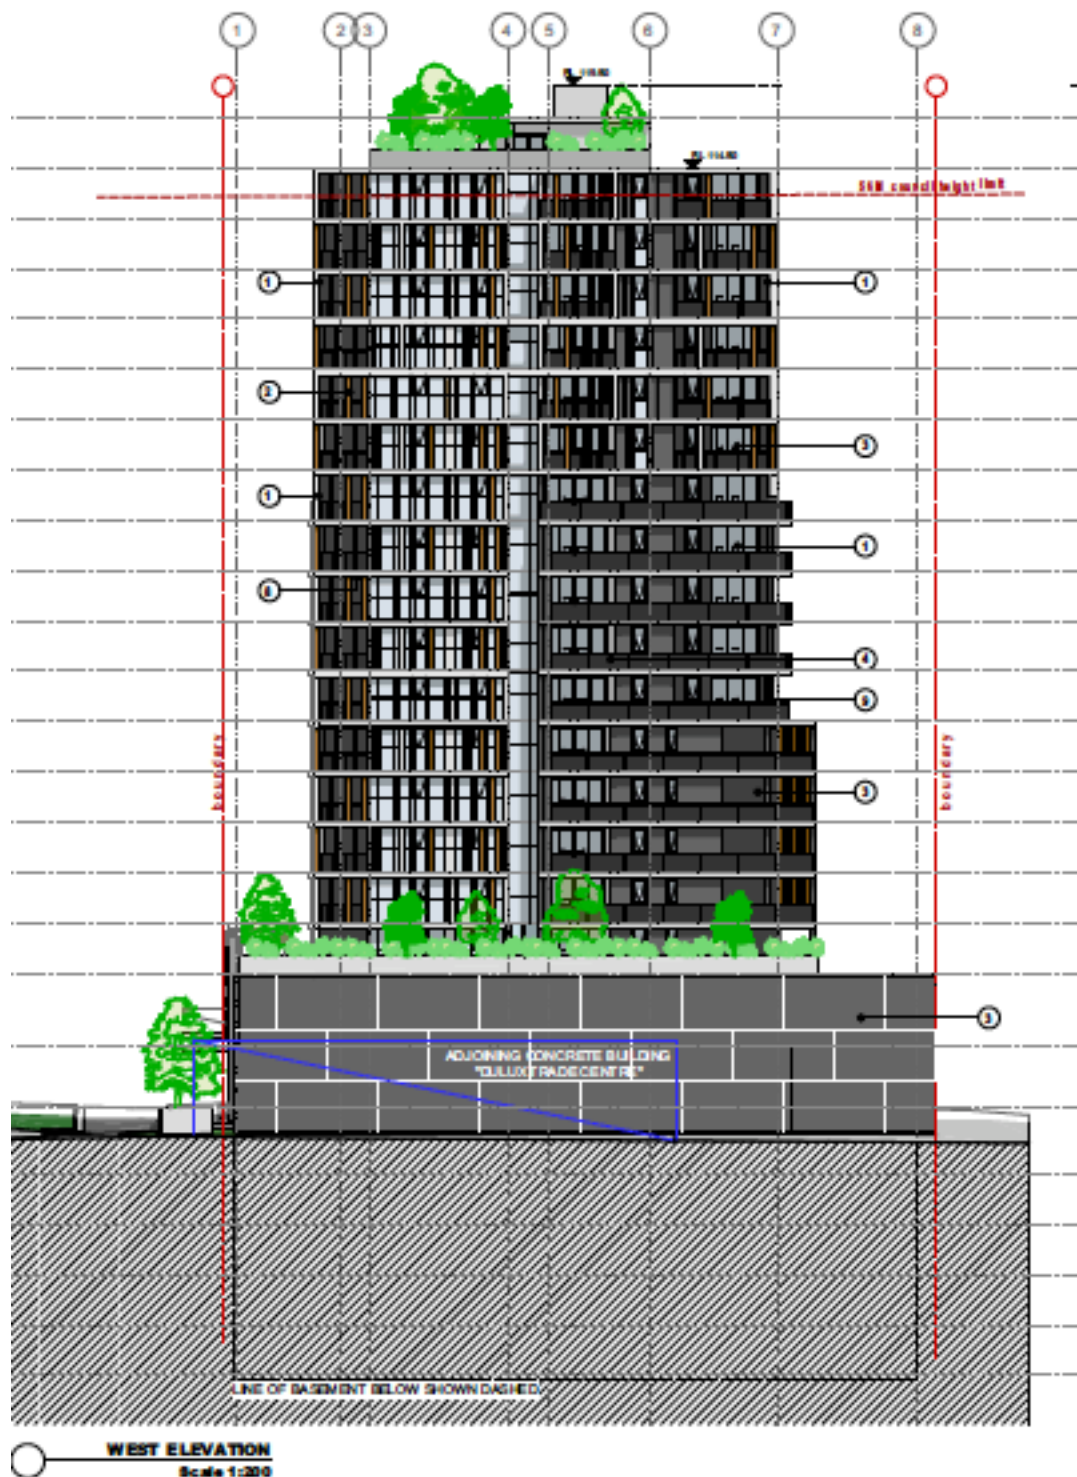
West Elevation of proposed building. Bedrooms windows are of reduced dimensions to minimise overlooking and ensure privacy. Screening elements on the balconies improve privacy.
